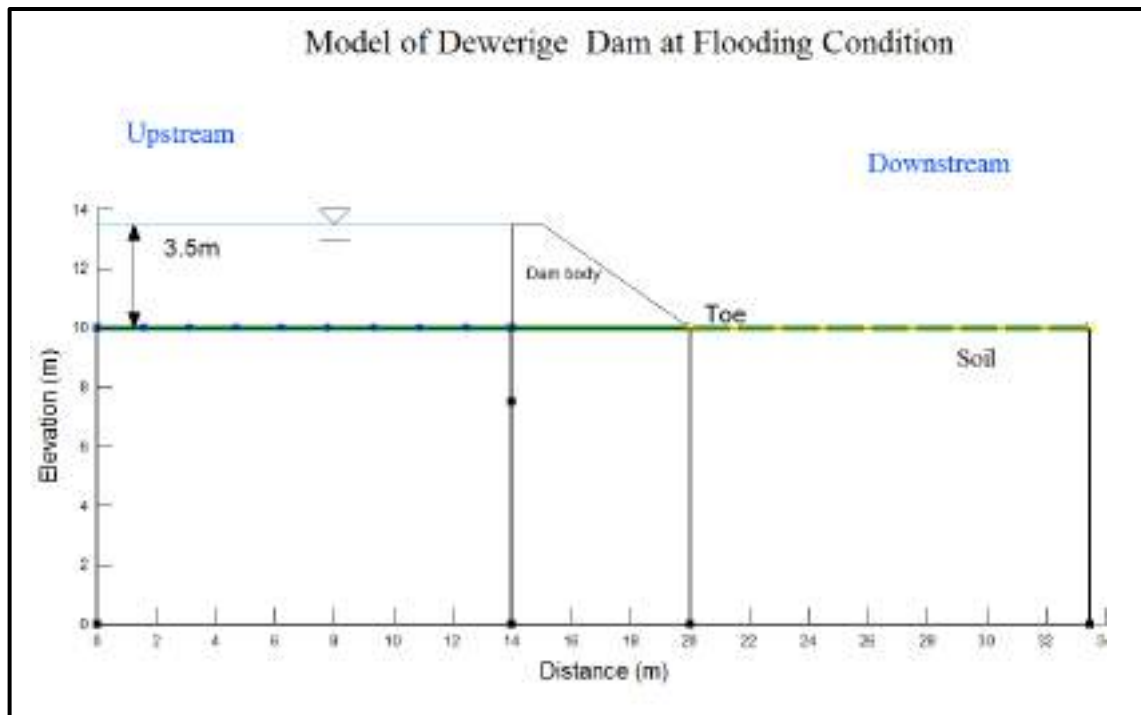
Cross-section of Dewerige dam by Seep/w model
